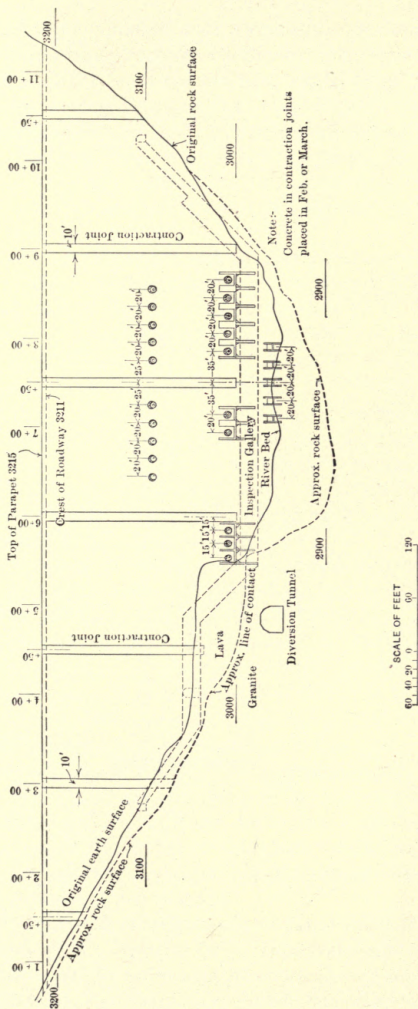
Elevation of Arrowrock Dam, Boise River, Idaho.
